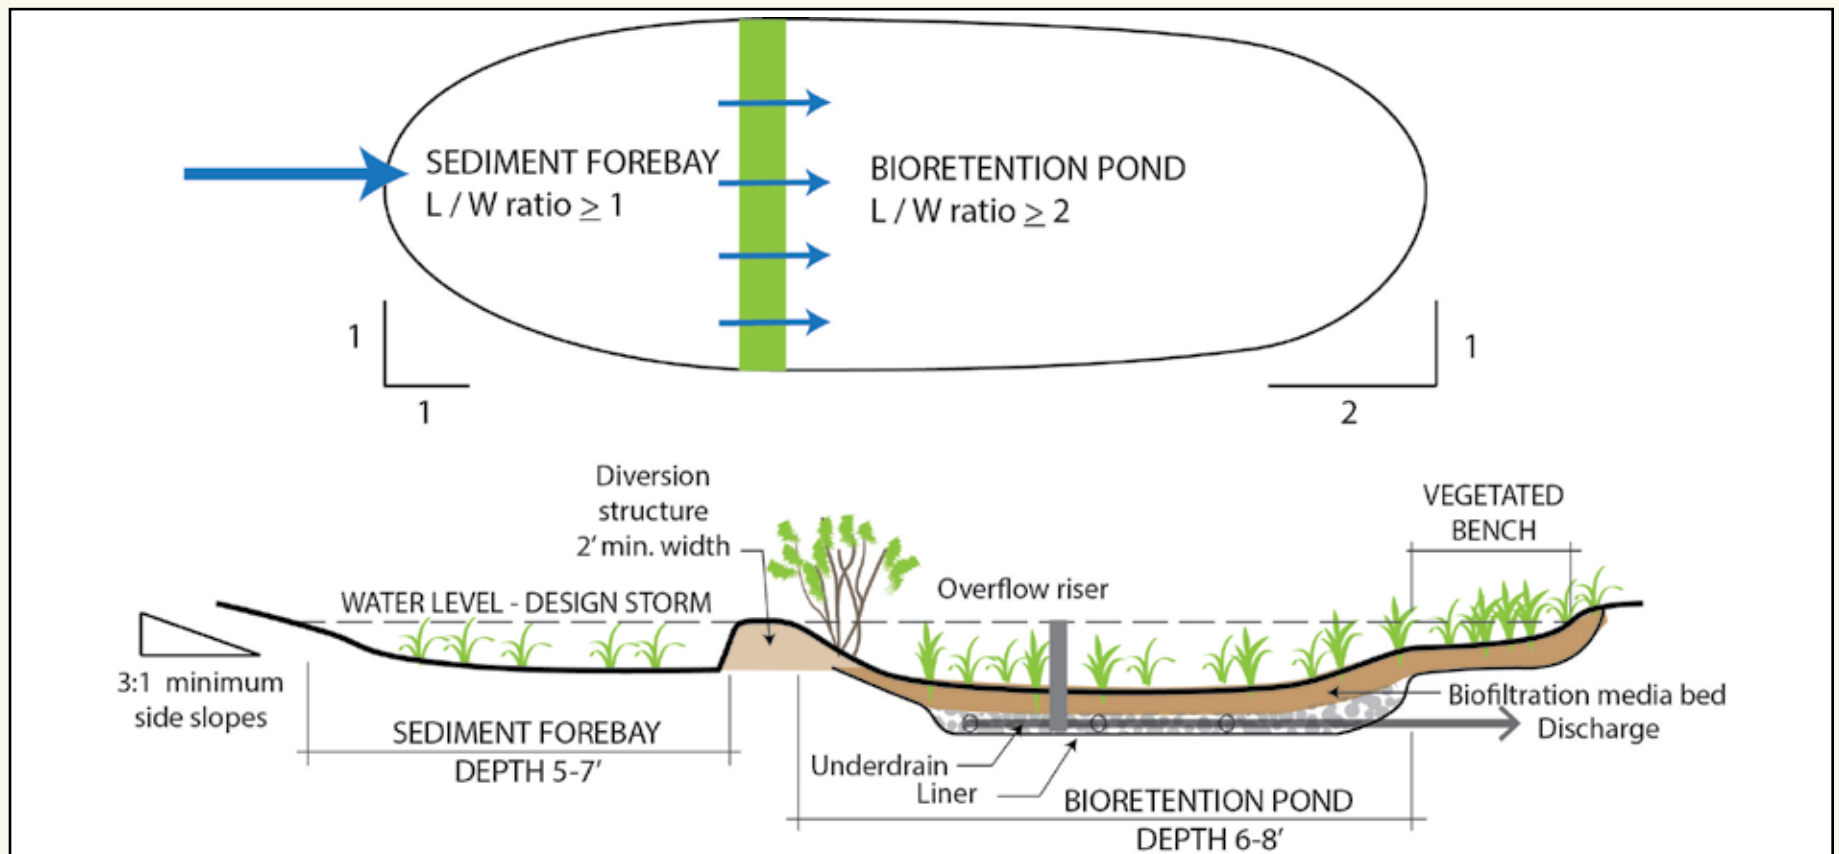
Schematic diagram and section showing typical bioretention pond (Austin ECM, Section 1.6.6 and 1.6.7).
